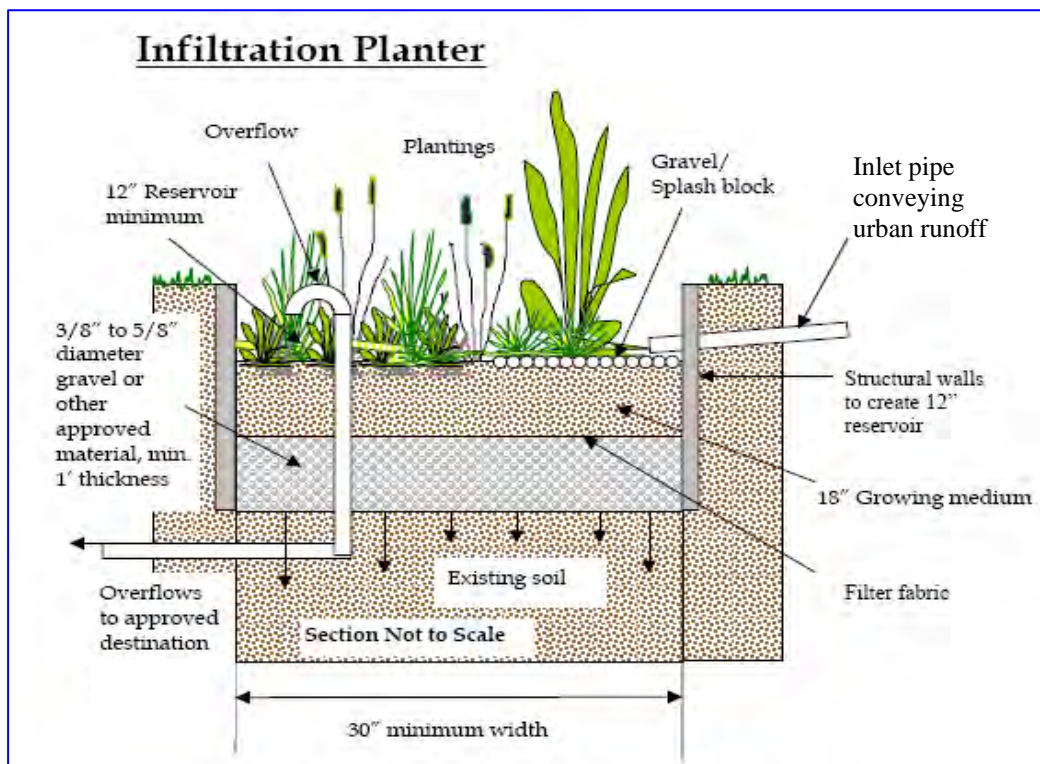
Schematic of a storm water planter that receives urban runoff from a pipe, drains directly to underlying soils, and overflows to the conventional storm drain system via an overflow pipe. (adapted from Portland BES).
